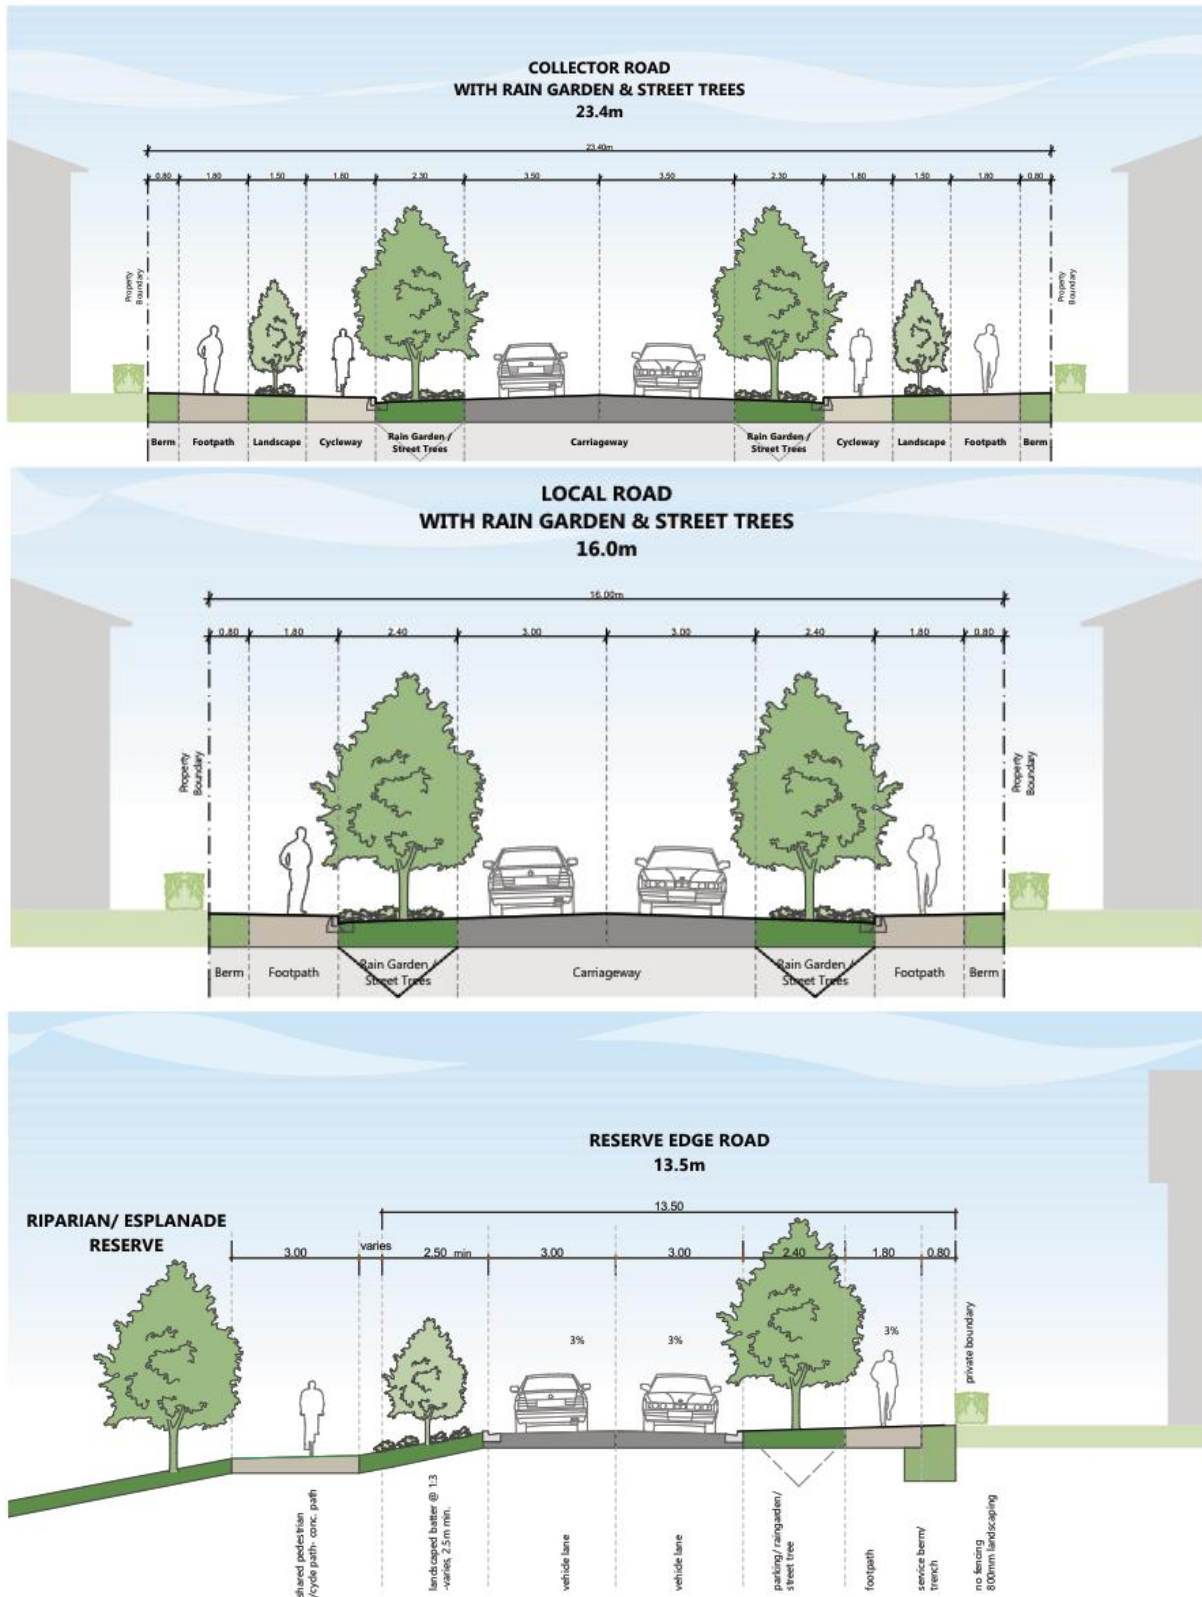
Proposed Road Cross sections provided by Oyster Capital (August 2019)
